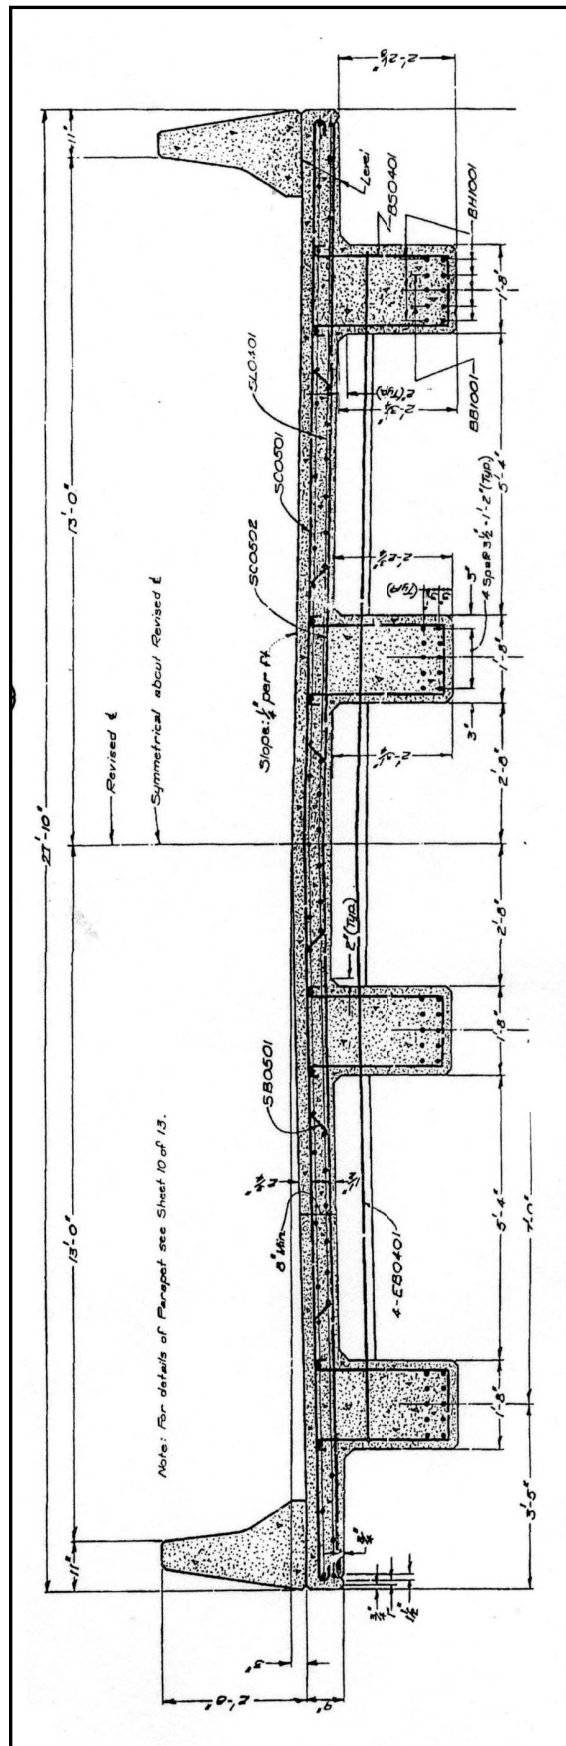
Elevation section of the RTE 697 Bridge near Rocky Mount, VA
